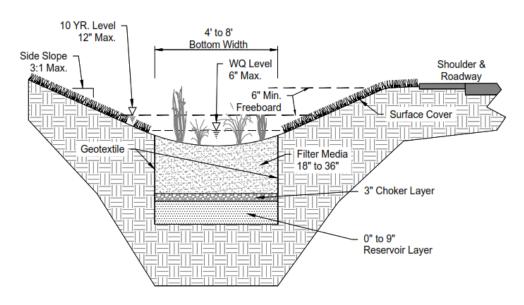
Typical Details for Level 1 and 2 Water Quality Swales
